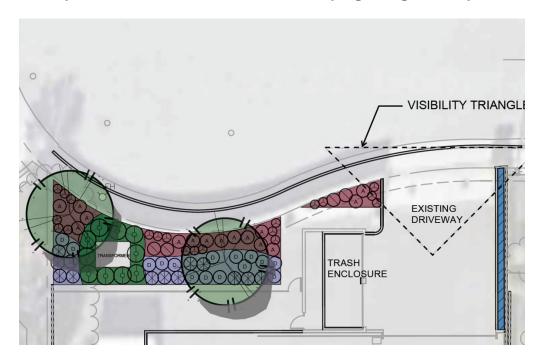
Proposed Block Wall and New Landscaping along Randolph Avenue
